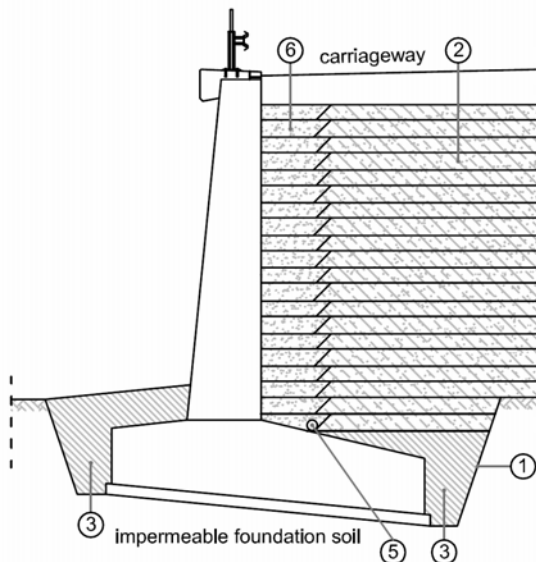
Connection of a fill made of cohesive material to the supporting wall (1 excavation, 2 backfill of cohesive material, 3 cohesive impermeable material, 5 drainage pipe, 6 filter)
